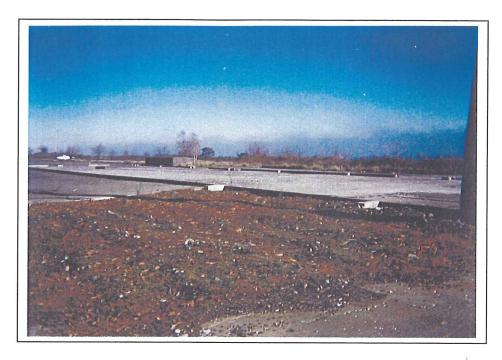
Foreground is a cut-out of asphalt, exterior southwest corner of building foundation. In the background, left of center, concrete protrusion of pre-existing loading dock, facing northeast (2/12/04).
